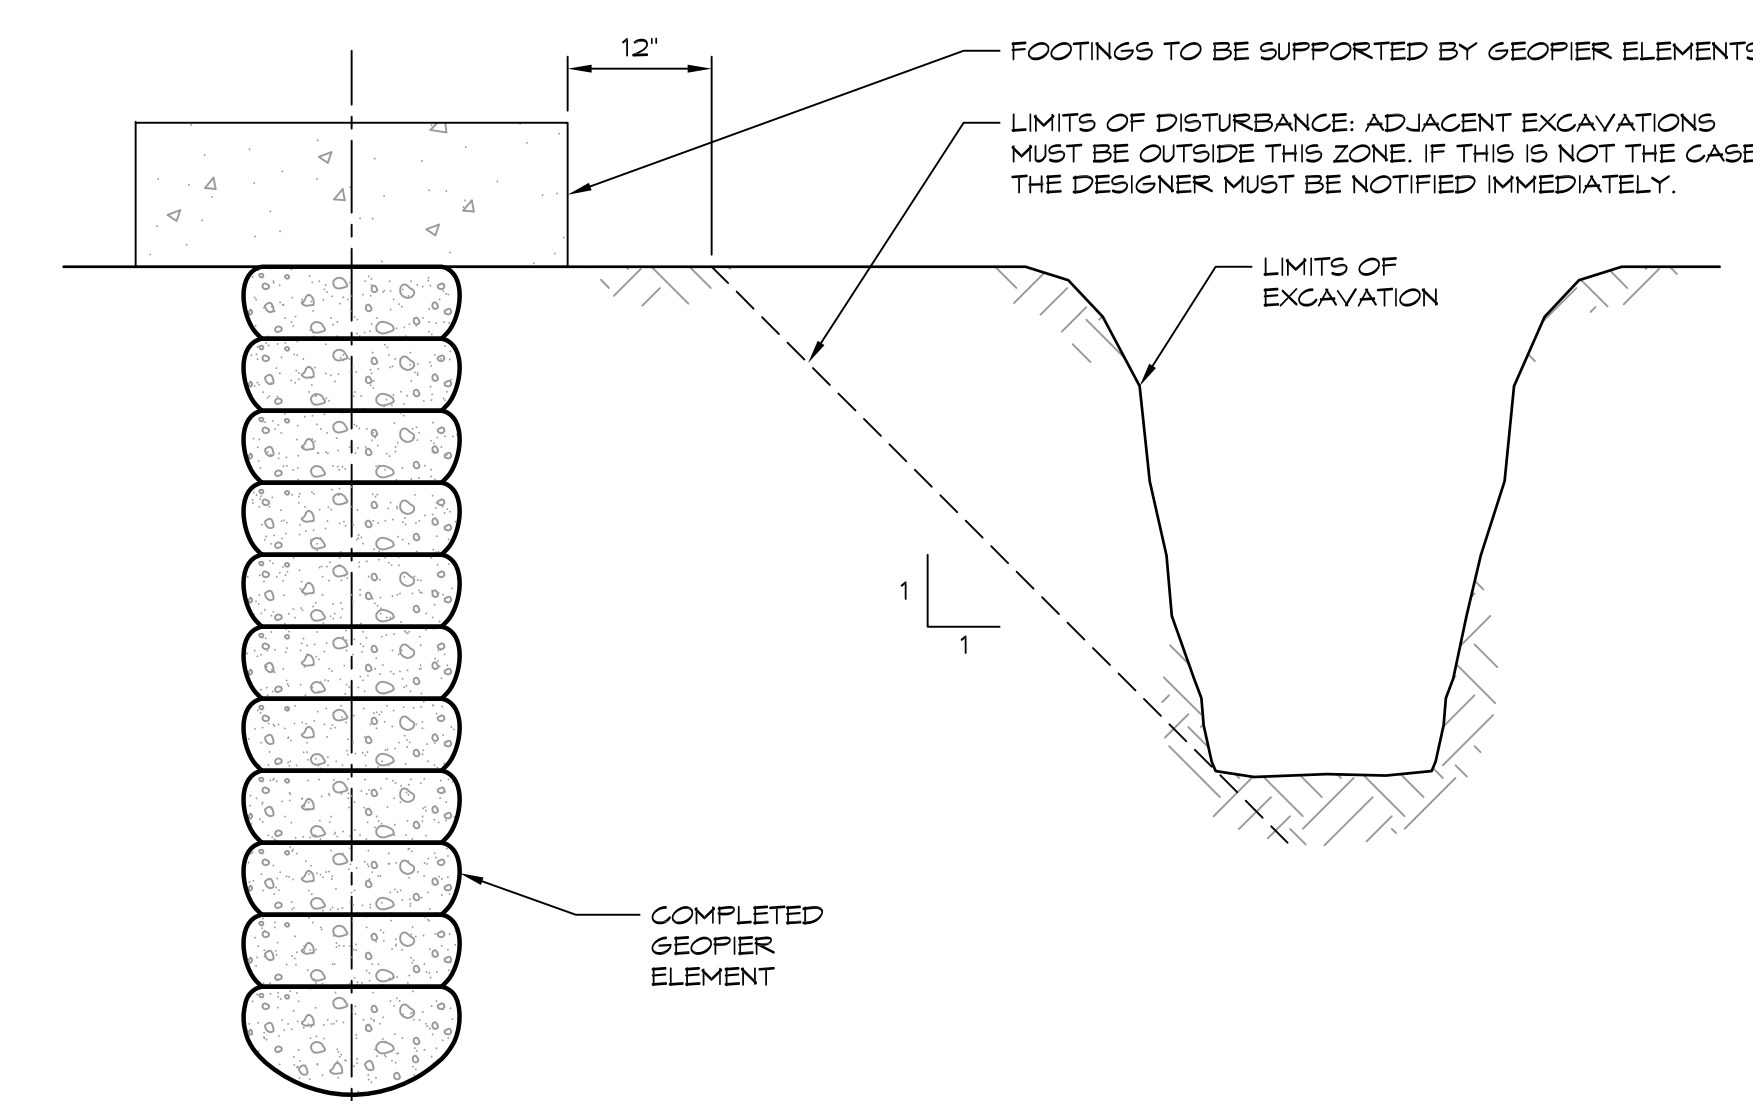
TYPICAL GEOPIER ELEMENT INDIRECT SUPPORT UNDER FOOTING
